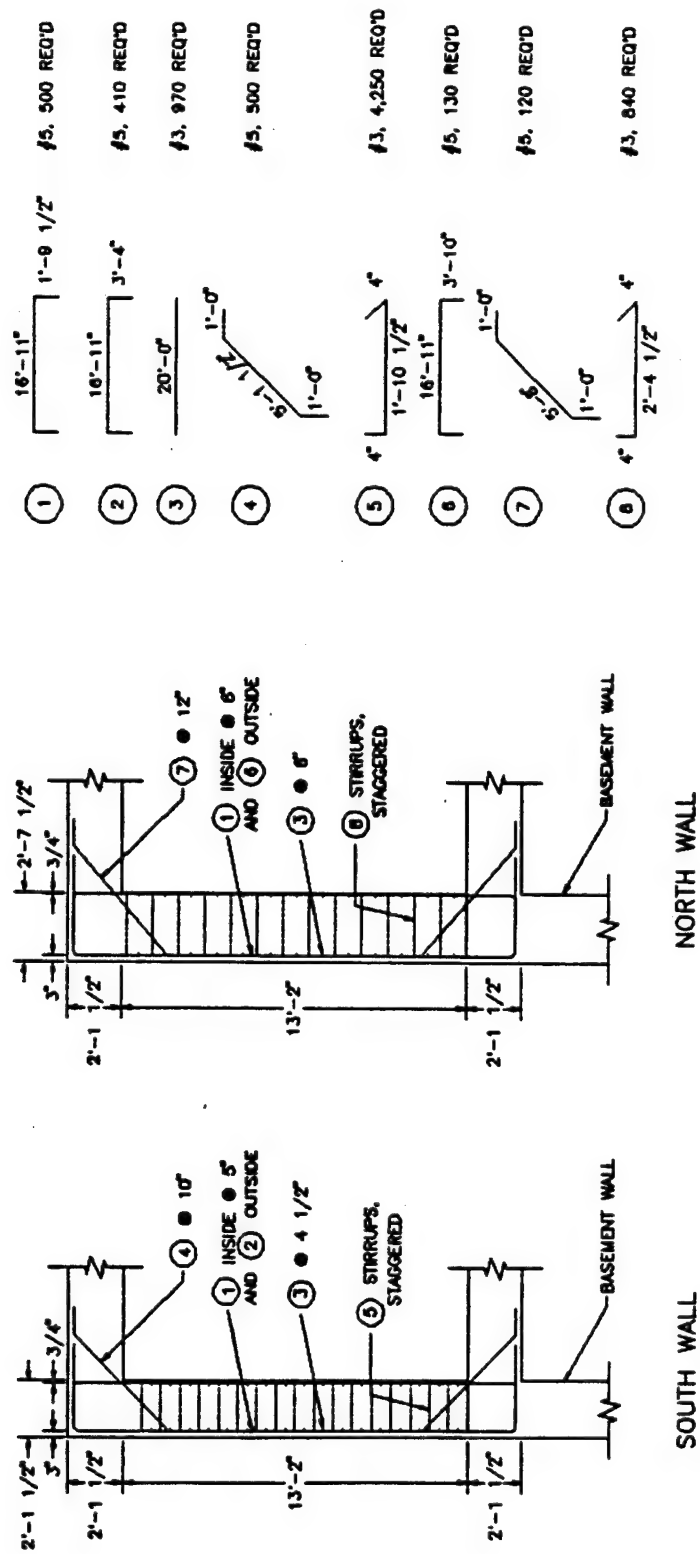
Tyndall Structure Test Wall Reinforcement Details.
